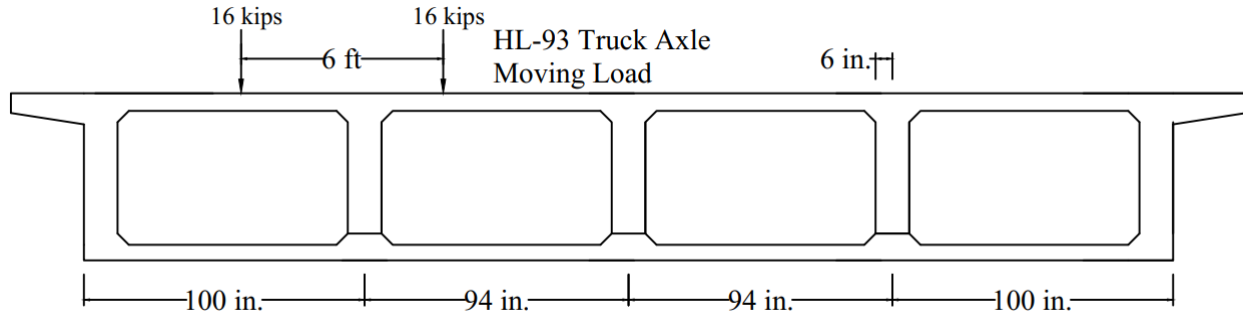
Cross section used in the FEM analysis, 4-cell box girder bridge example
